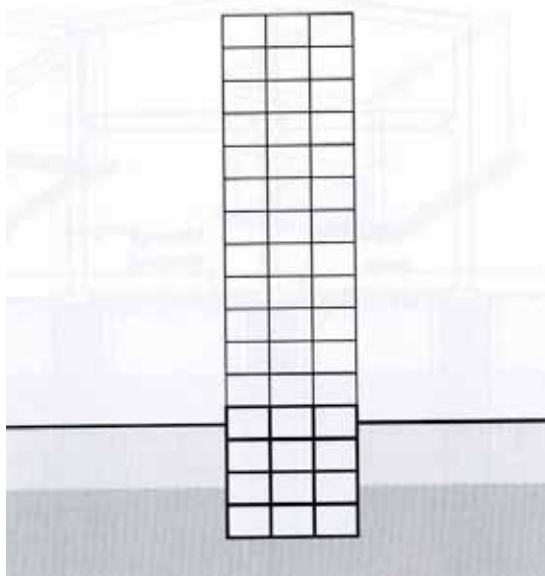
buried floors for west wing foundation at Phaistos palace (LEVI, 1976)
